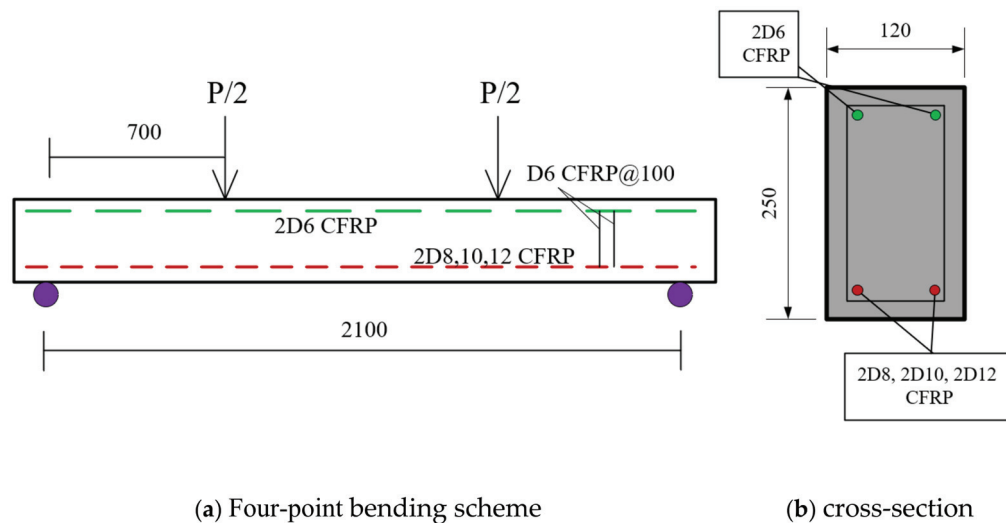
Section geometry and schemes: Illustrated are the dimensions of the CFRP-reinforced concrete sections, where D denotes the diameter of the CFRP bars. This specific section geometry was adapted from Wang et al. [44] study.
